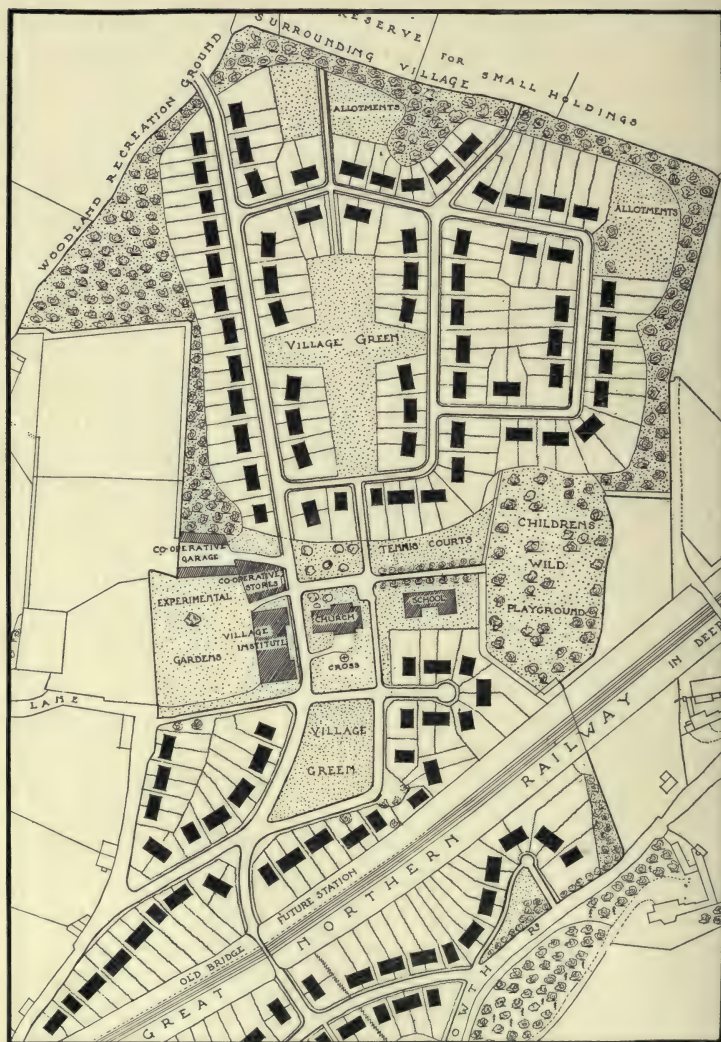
Lay-out plan of Killestre Housing Scheme near Dublin ;
